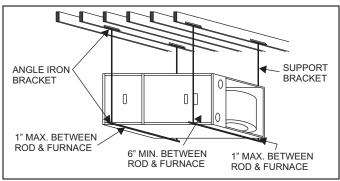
Typical Suspended Furnace / Crawl Space Installation
